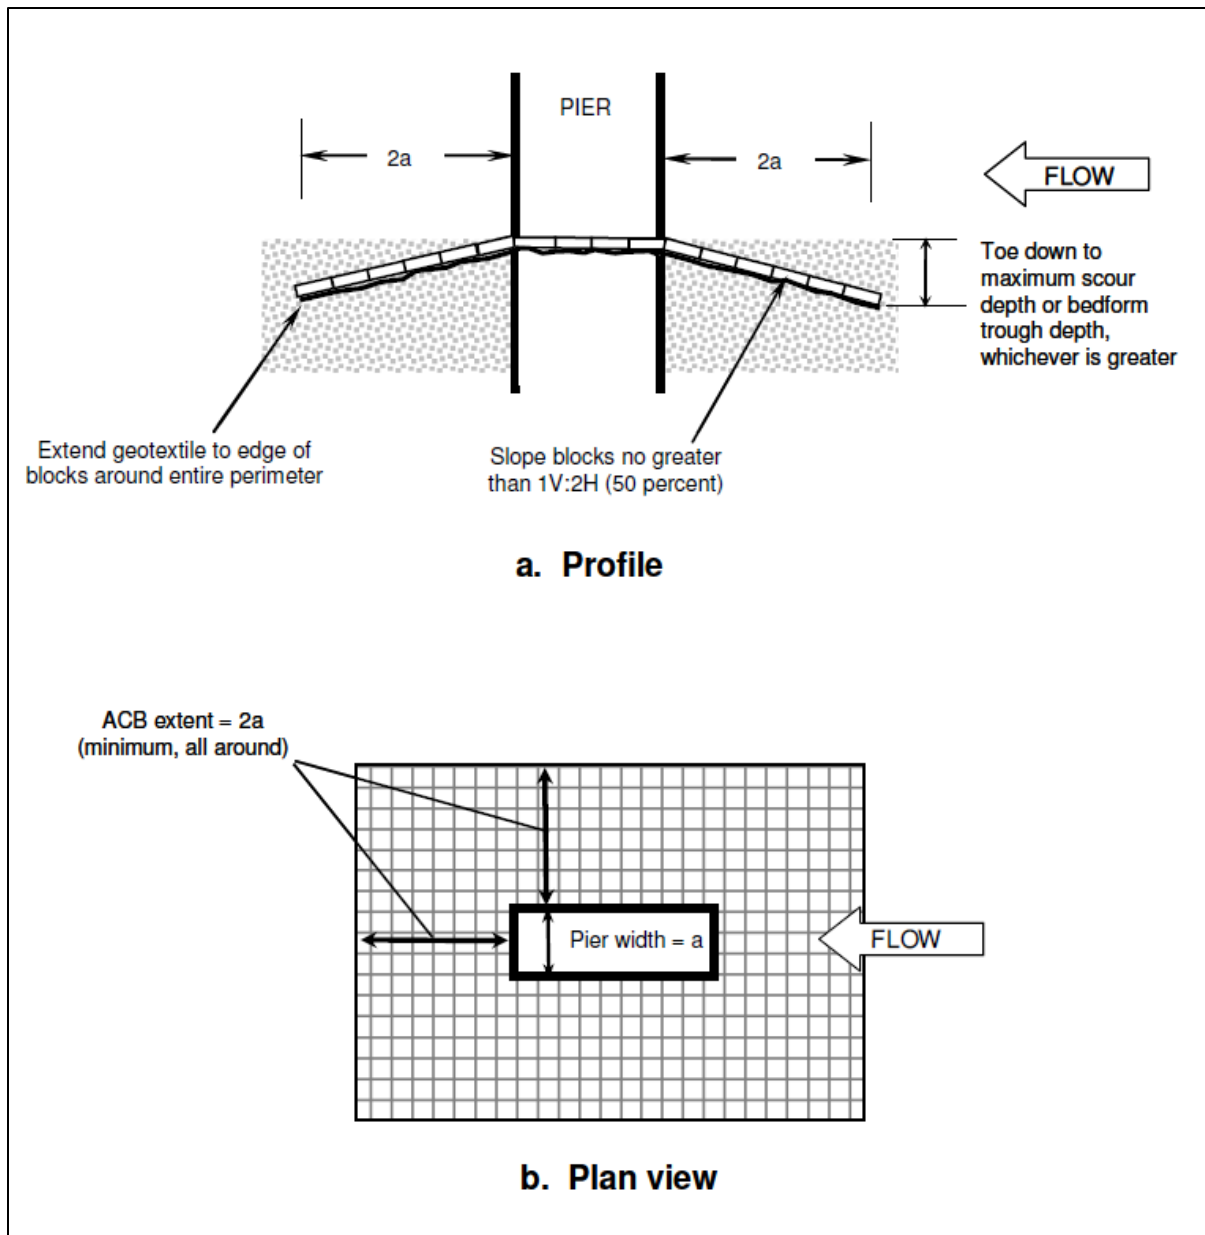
ACBM layout diagram for pier scour countermeasures (Lagasse *et al*, 2009 Vol. 2).
